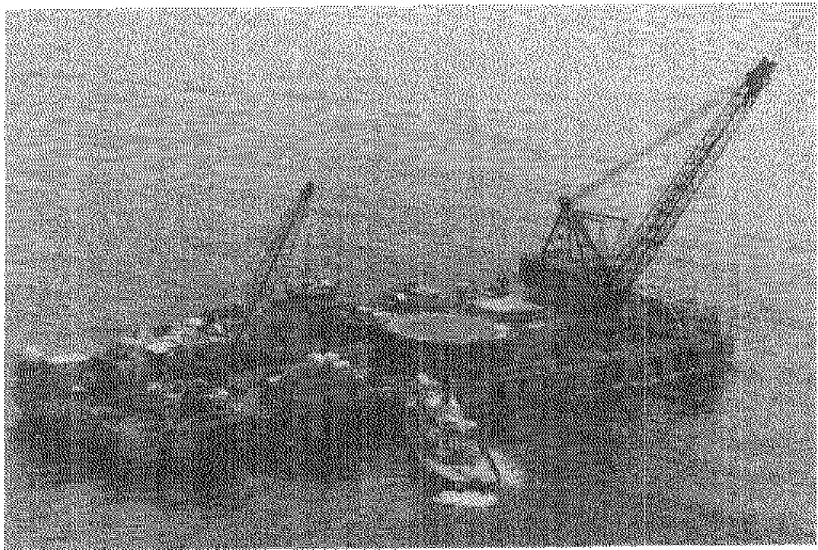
Pipelay Barge. *BAR 323* is designed to lay pipe up to 56 inches in diameter. (Photo: Brown & Root)
